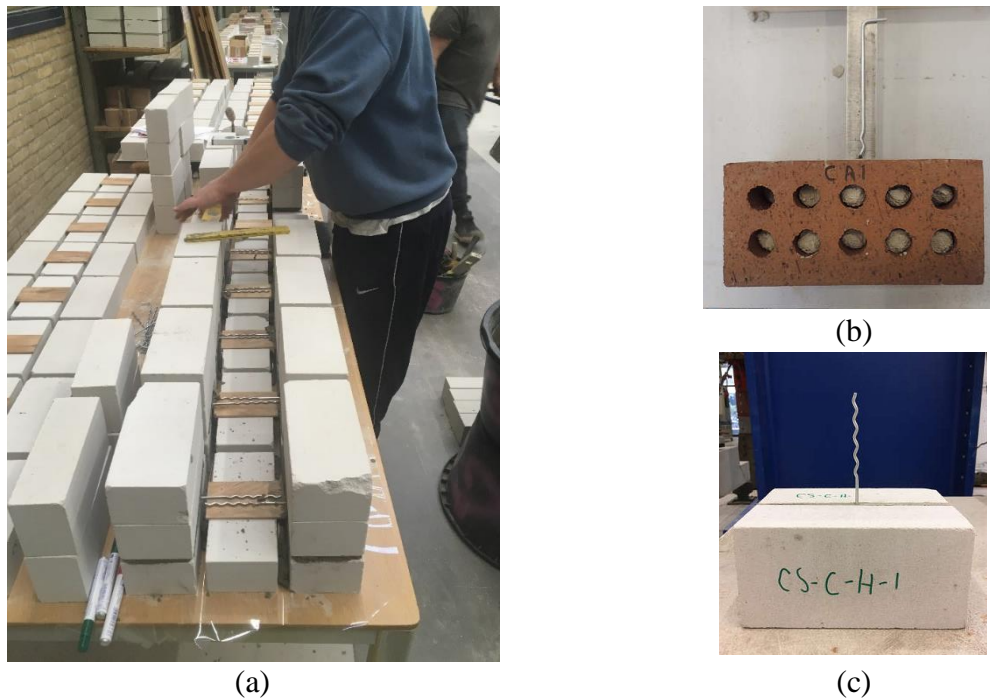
Construction details of the tested specimens: construction of CS specimen (a), example of a CB specimen (b) and of a CS specimen (c).
